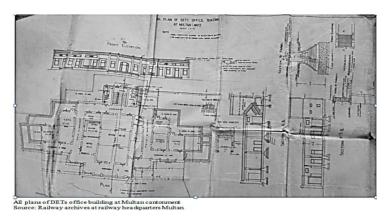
Cluster of rooms of the DETs building shows the security plan, protection from extreme weather and easy to approach one record room to other. The plan holds galleries and parts of rooms to make management better. Whole the plan has been designed to keep aesthetic sense and functionality in mind. Different sections and opening (windows & doors) are visible in the drawing plan. <sup>10</sup> (See Fig P2)
